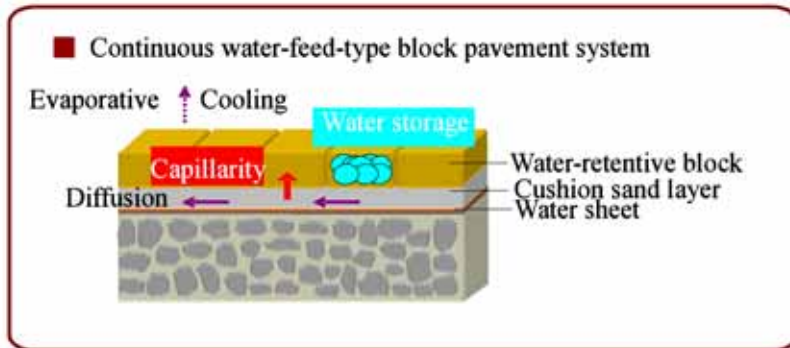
Schematic drawing of continuous water-feed-type block pavement system
